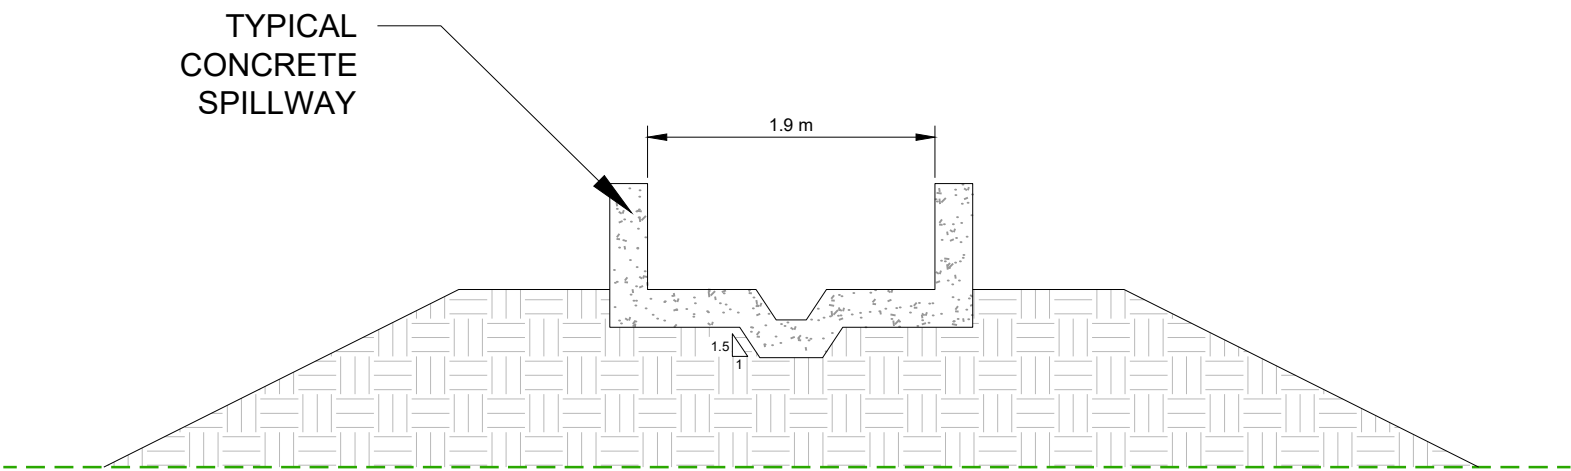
; TYPICAL CONCRETE CULVERT FOR SPILLWAY AT CLOSURE (Scale: 1/20 A1)
